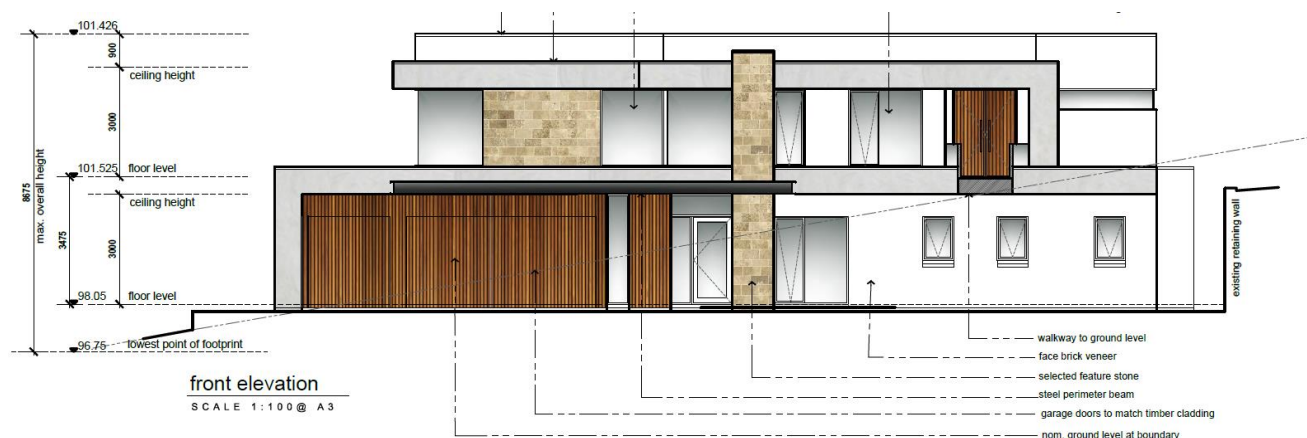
Continuous 2 building levels will have a single storey appearance for the eastern portion of the frontage when viewed from the front elevation.
